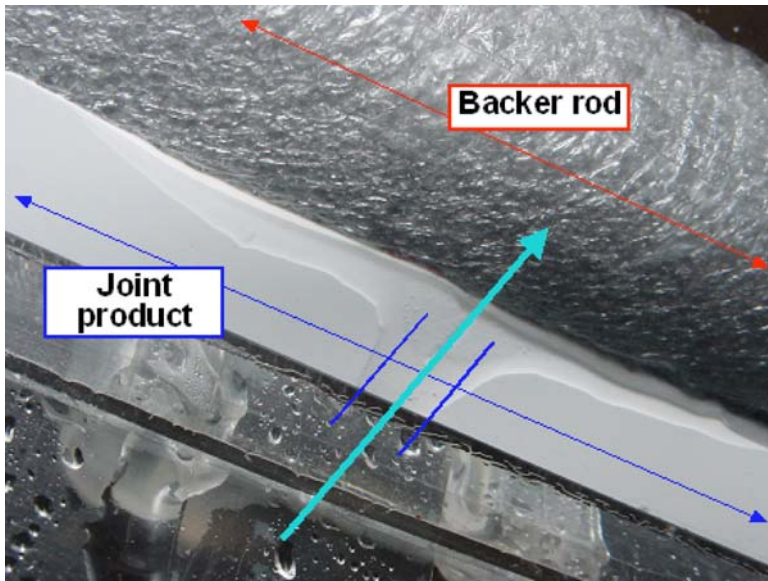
View of underside of horizontal joint showing backer rod and location of crack (16 mm) opening along jointing product; arrow shows direction of water leakage across joint.
